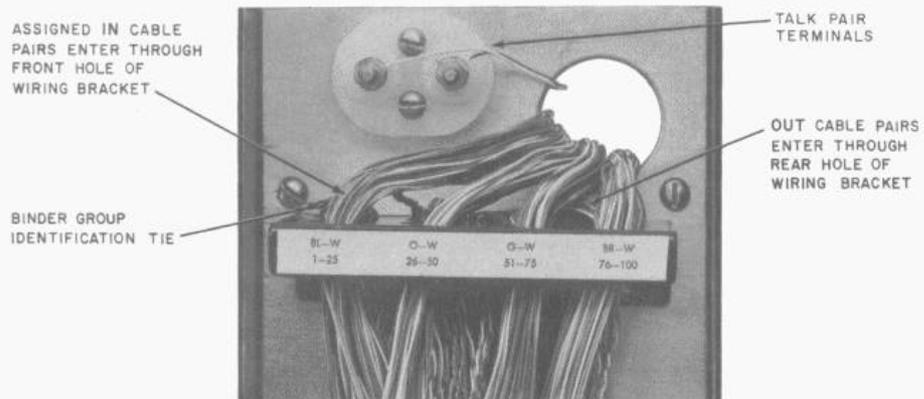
Assigned *IN* Cable Pair Routed Through Front Holes of Wiring Bracket
